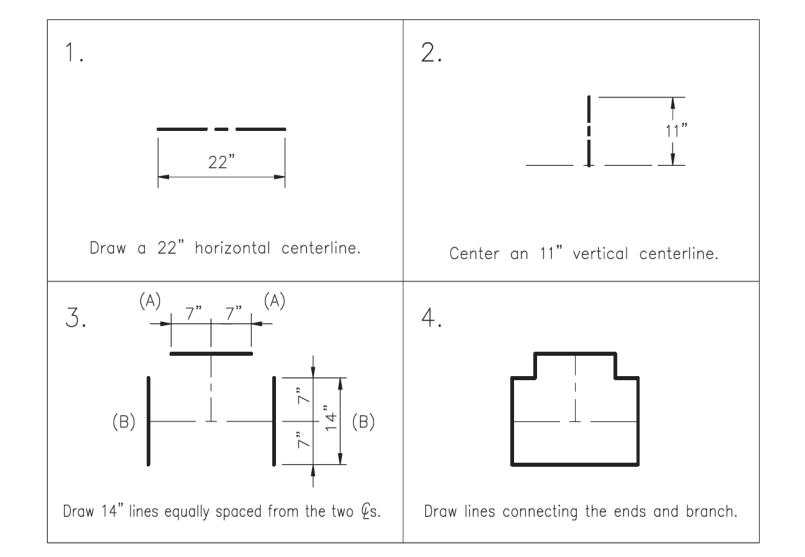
14" Welded straight tee drawing symbols.
